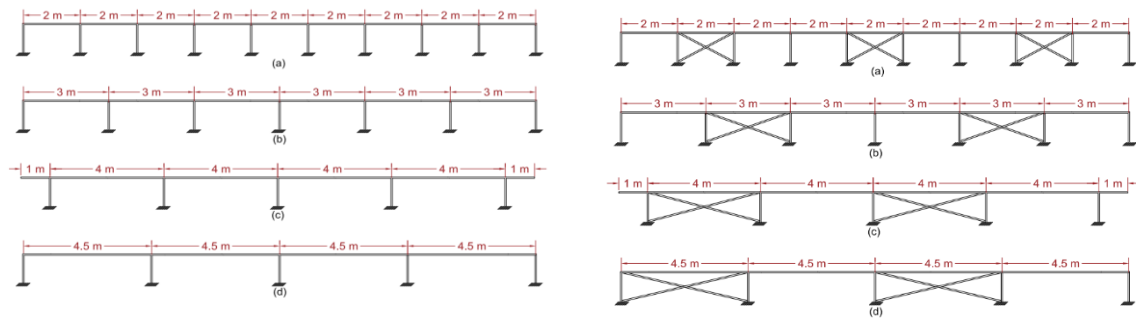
Span lengths and column arrangements for building (Type II), (a) 2 meters, (b) 3 meters, (c) 4 meters, (d) 4.5 meters (Author)
